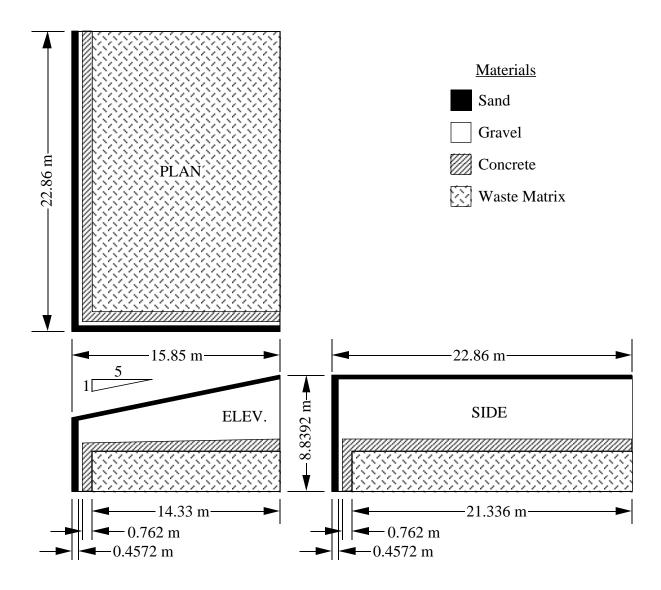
Elevation, plan, and side views of 1:5 slope configuration three-dimensional model.
